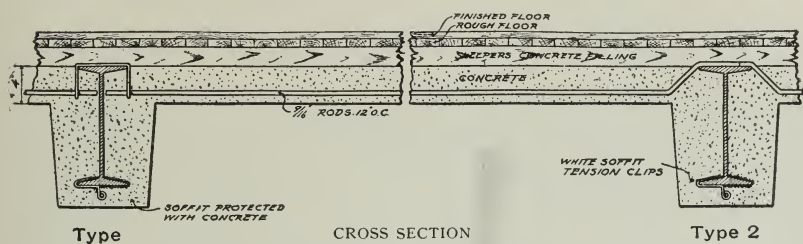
b. White Concrete Flat Floor Arch, System B.
